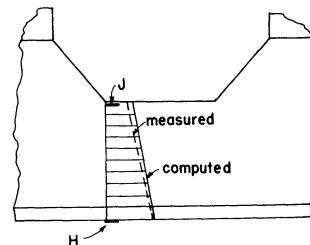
Working load stress distribution in chord of Beam 2 as determined by gages H and J
